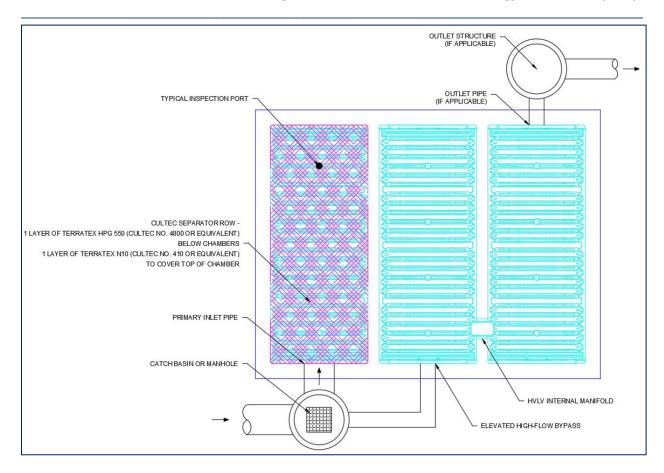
Cultec Separator™ Row Filtration System – Plan View
